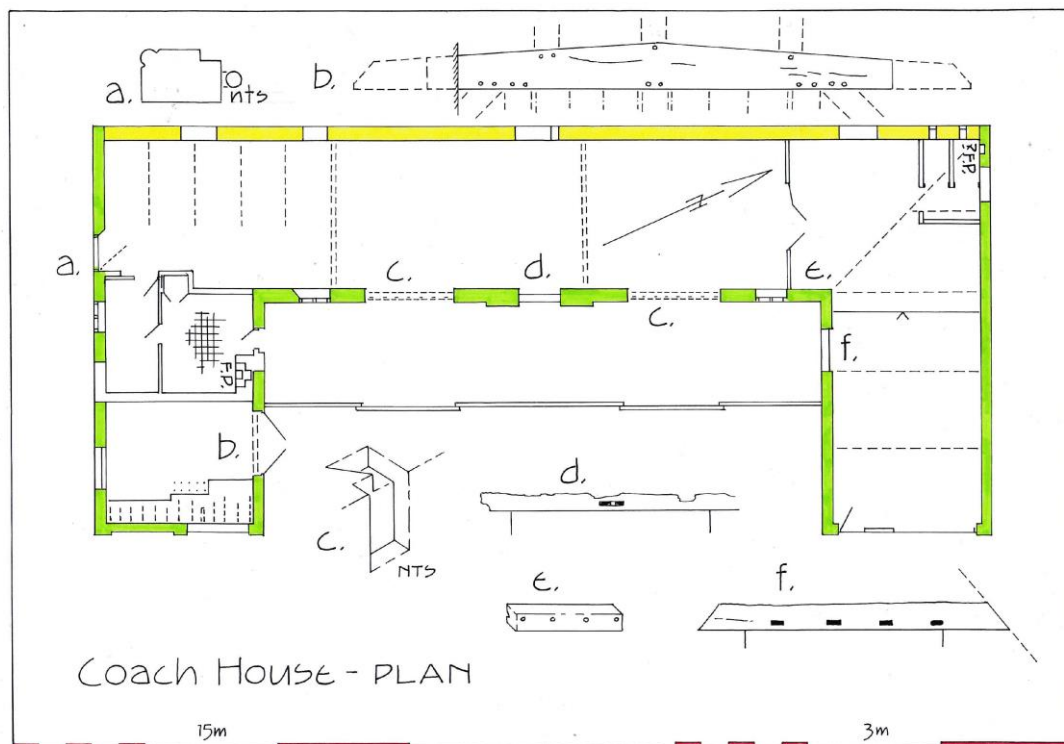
; plan showing Elizabethan masonry; yellow, 1702 re-build; green
